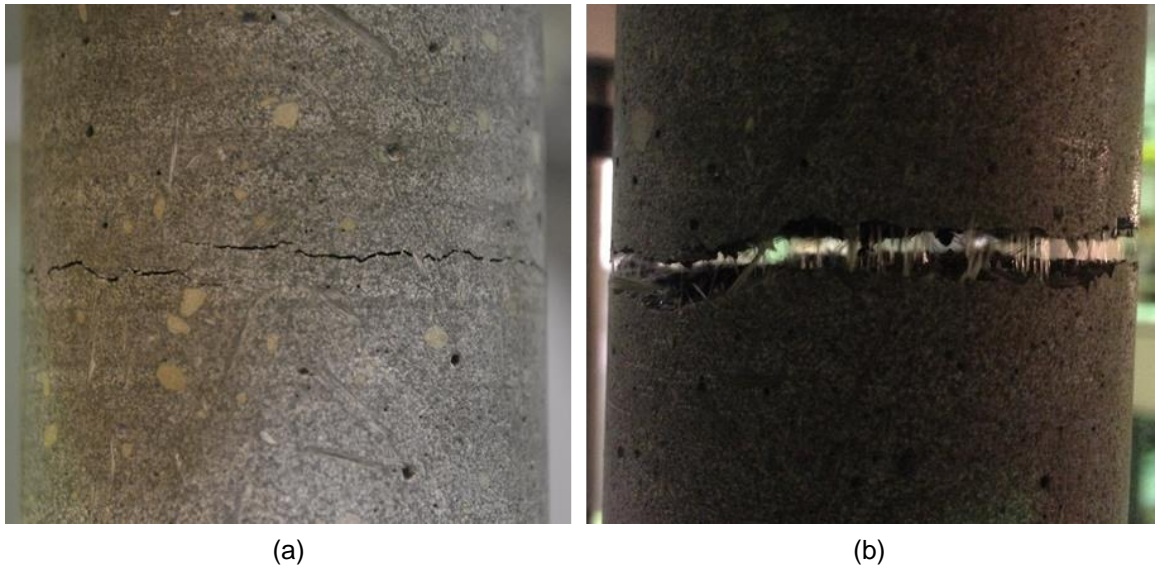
Fracture Phenomenon, (a) A8 Overlapping Cracks, (b) A5 Fiber Crack-face Bridging
